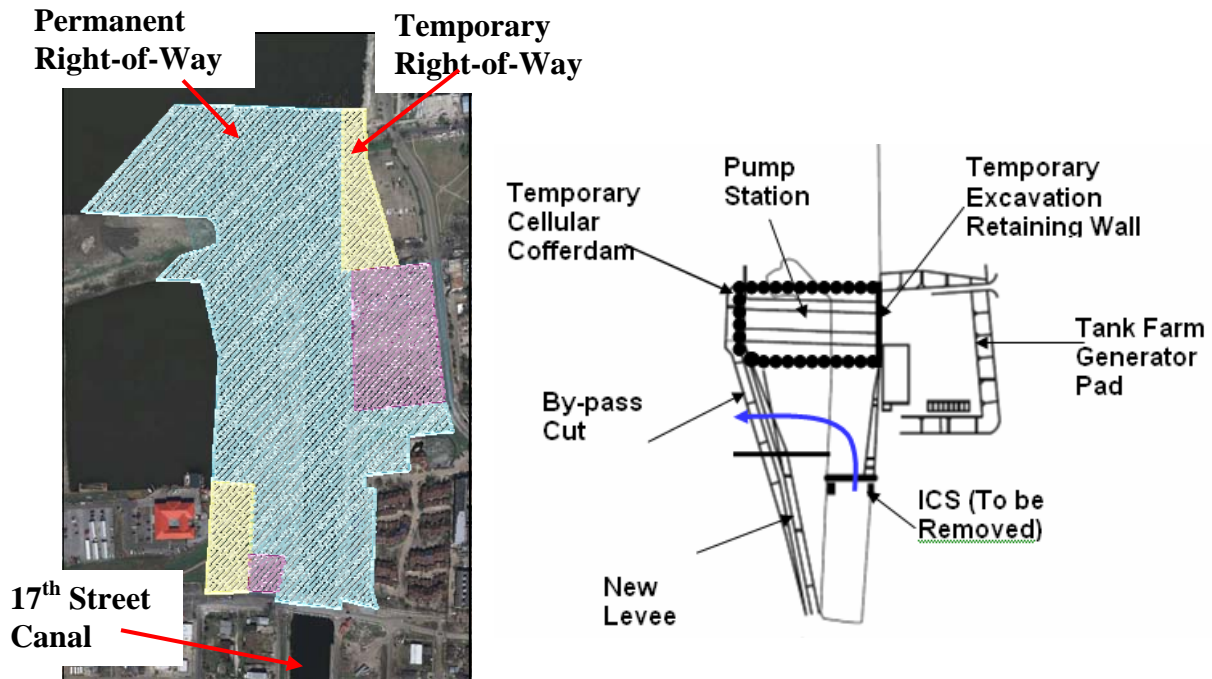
17th Street Canal – Proposed Permanent Protection Location A
